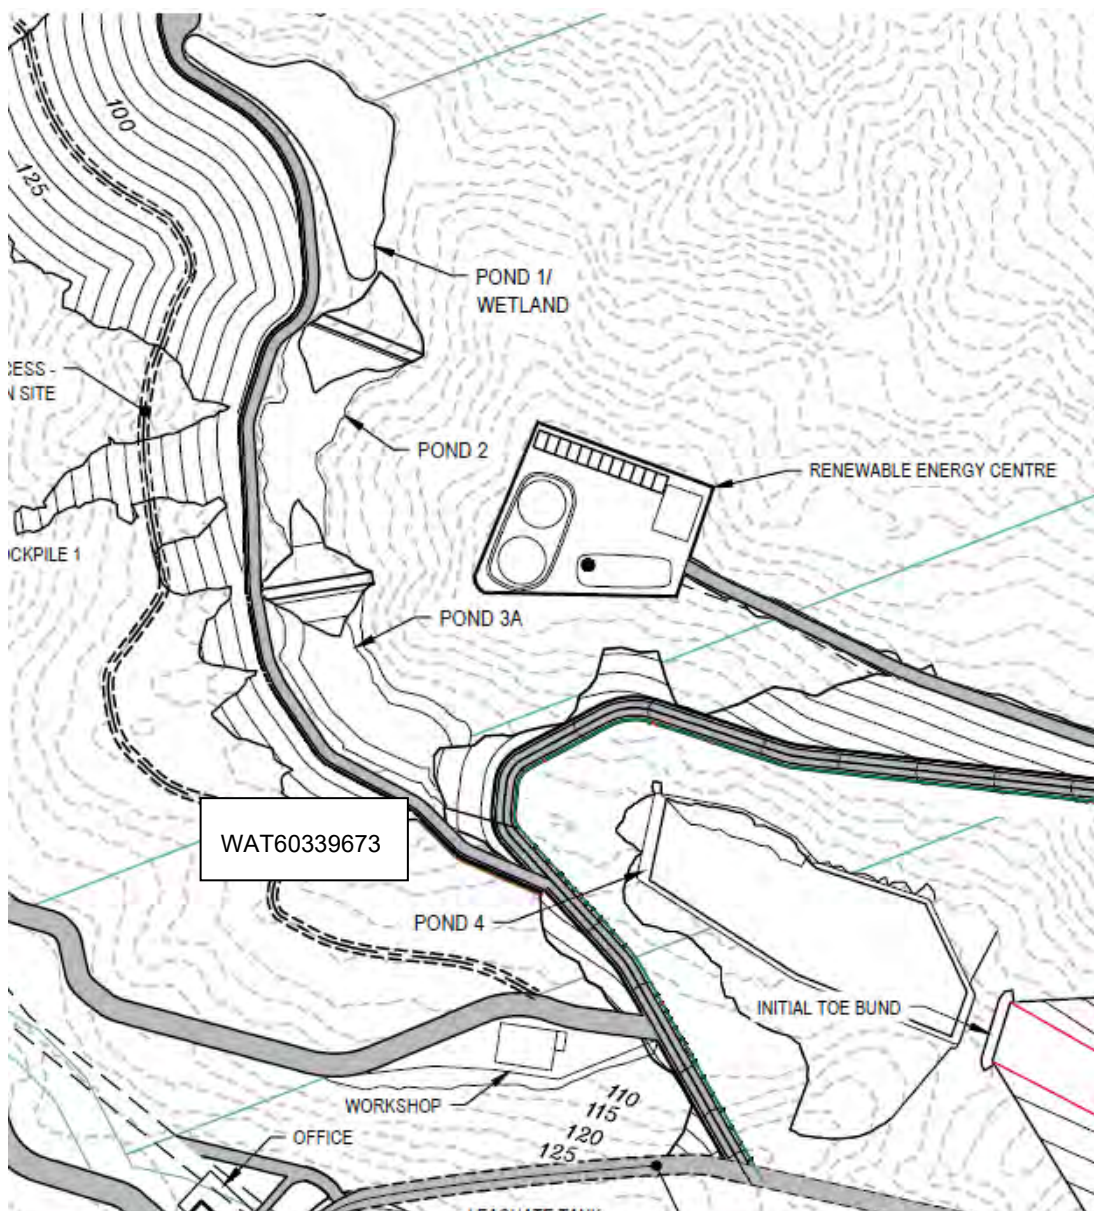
Waste Management NZ Ltd – wetland pond #1 and stormwater ponds # 2 - 4
